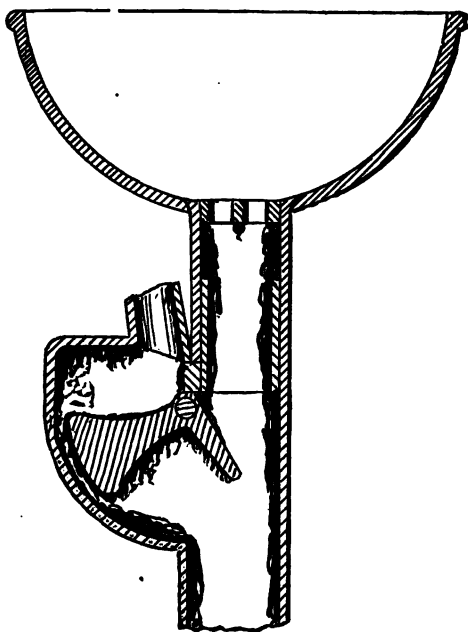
Valve Outlet Basin, with Valve Chamber or Container collecting filth.
